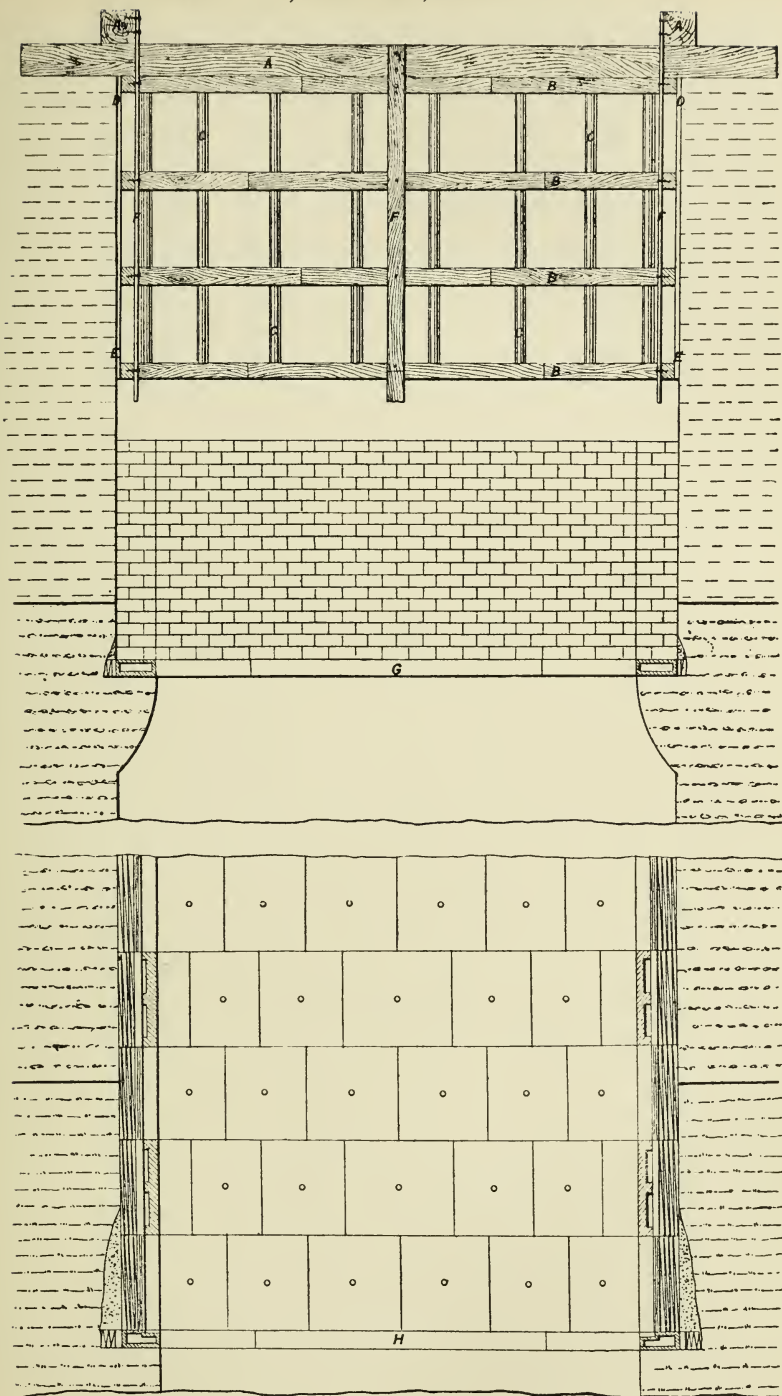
TIMBER, WALLING, AND TUBBING IN A SINKING SHAFT.
